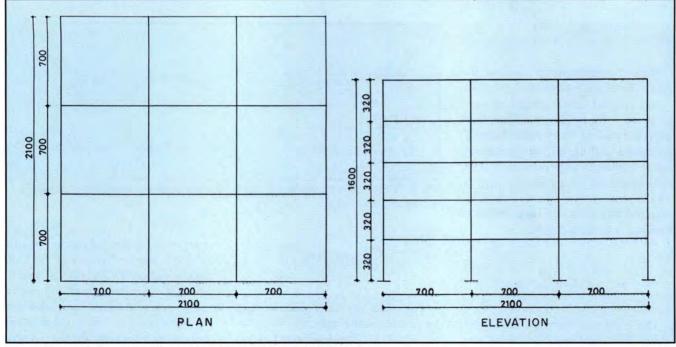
Plan and elevation of the analyzed frame (dimensions in cm).
